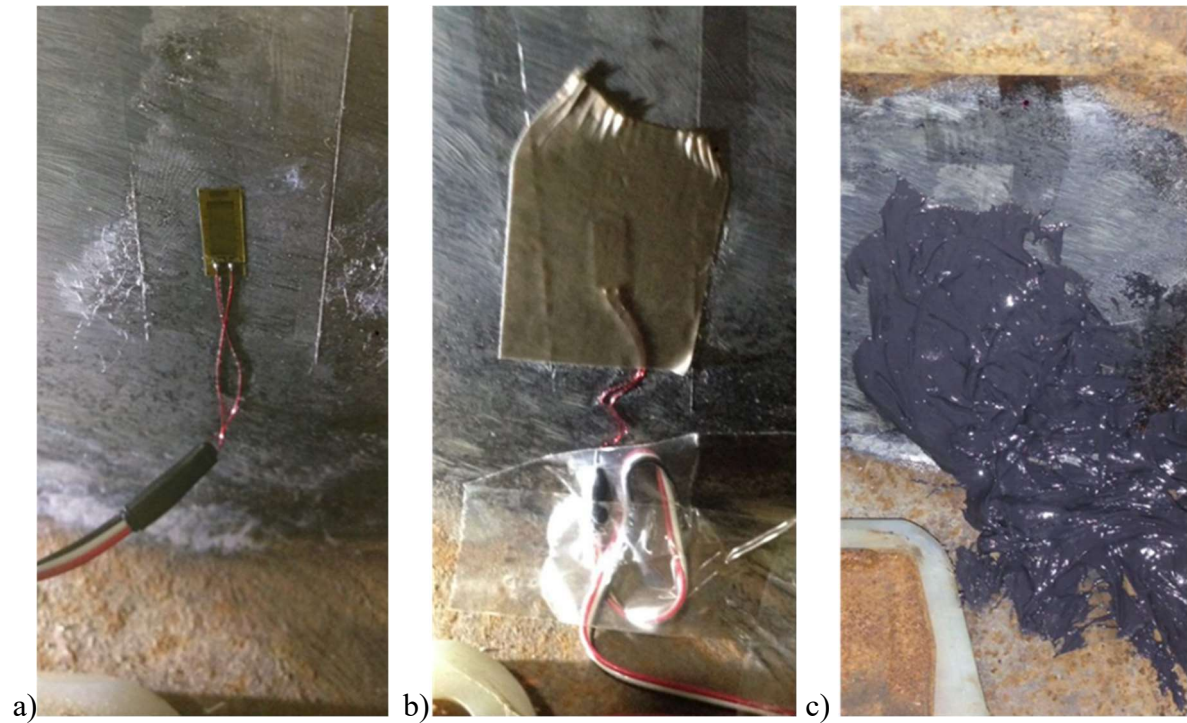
Strain gage installation process showing a) strain gage adhered to steel surface, b) strain gage covered with adhesive tape, and c) tape covered in waterproof painted-on protective layer
